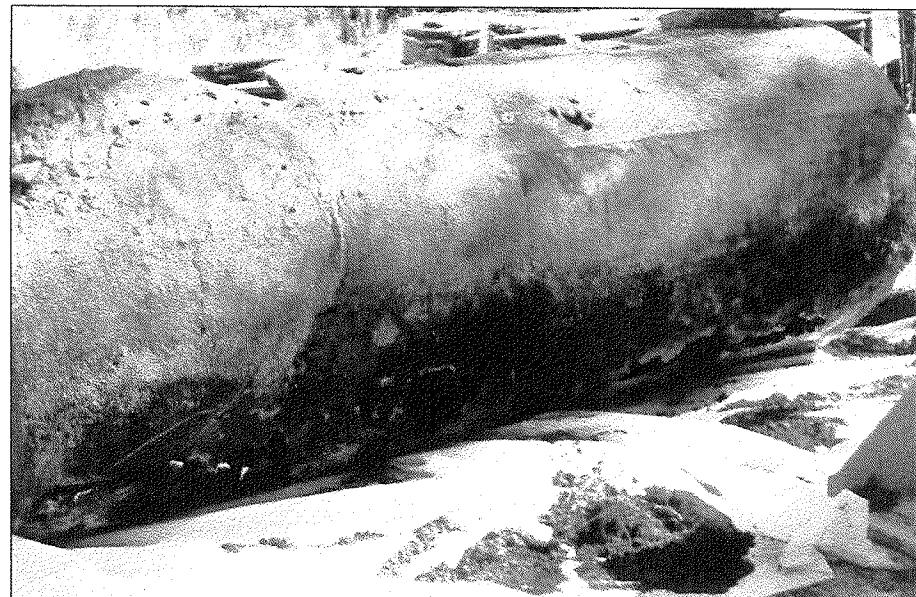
Removed tank showing severe corrosion damage. (9-24-97)
